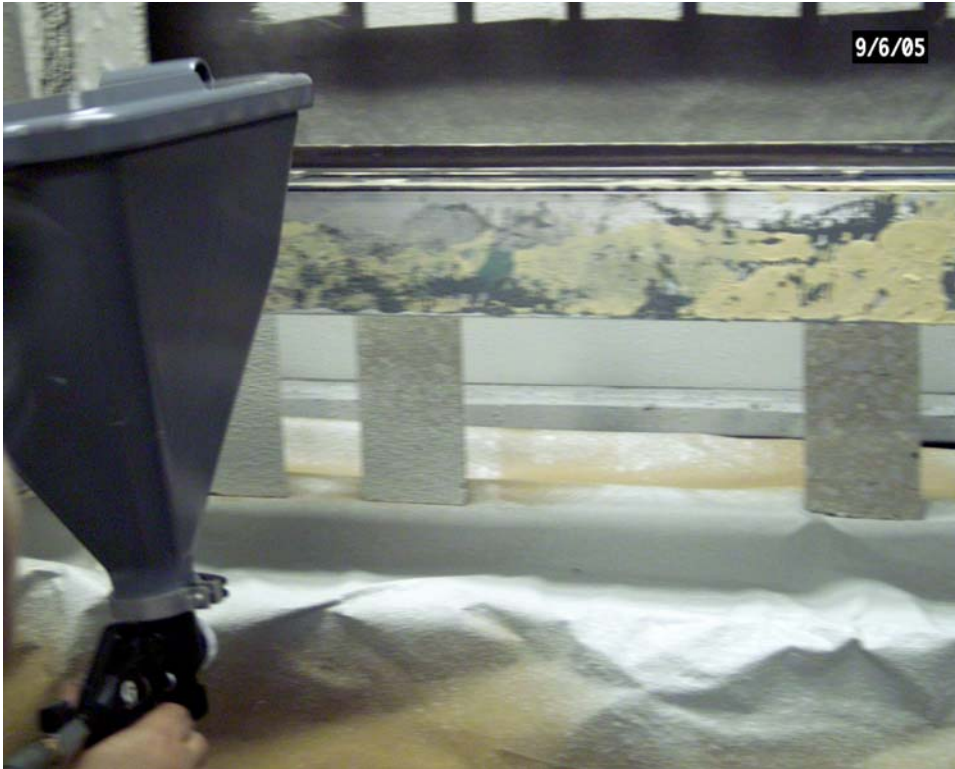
Spraying concrete cylinder blocks for adhesion tests
